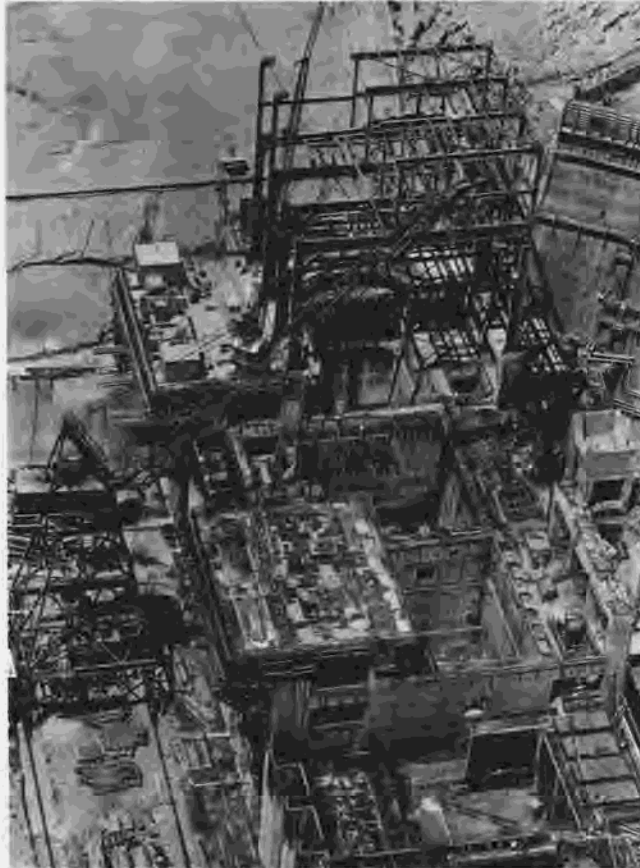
View looking down on unit bays 1, 2, and 3 of the powerplant. Note steel erection in unit bay 1. P557-420-6105, June 22, 1961.
